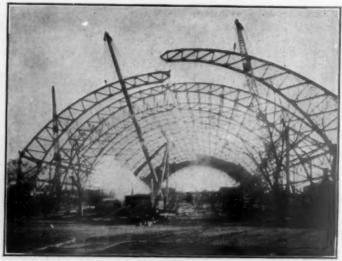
LAST MALF OF LAST TRUSS IN PLACE, AND FIRST HALF BEING SLIPPED DOWN TO HAVE TOP PIN MEET
